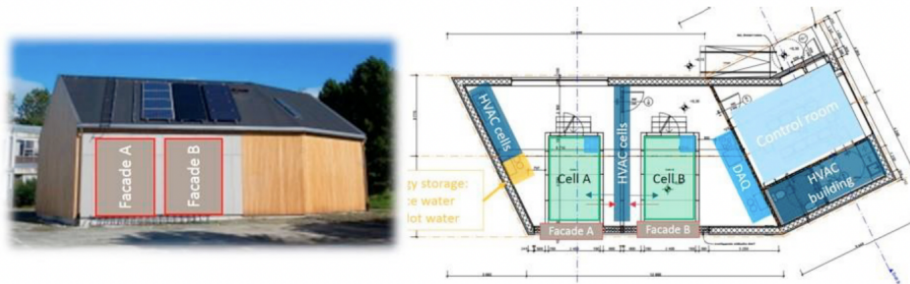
ZEB Test Cell Laboratory; View from south and Plan of the building (Goia, Schlemminger, and Gustavsen, 2017)
